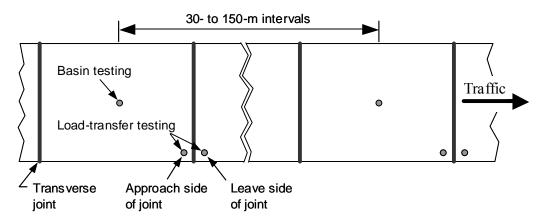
Recommended deflection testing locations for jointed concrete pavements.
